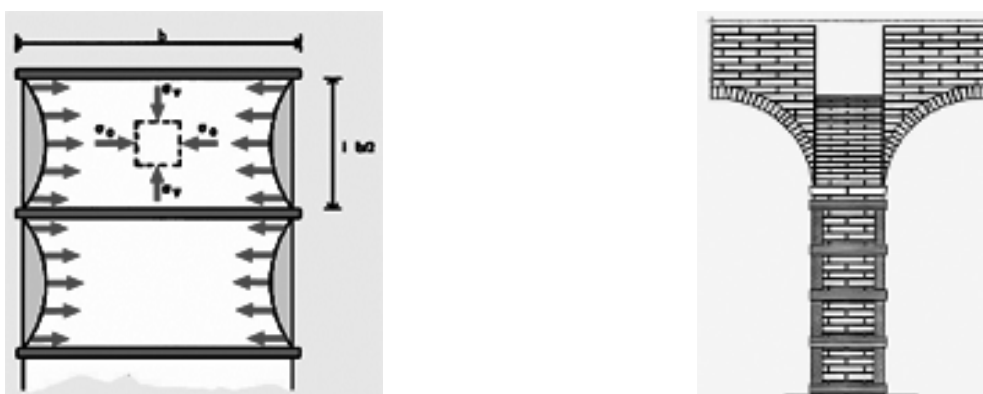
Confining action of compressed elements, (Source: POLIMI).
